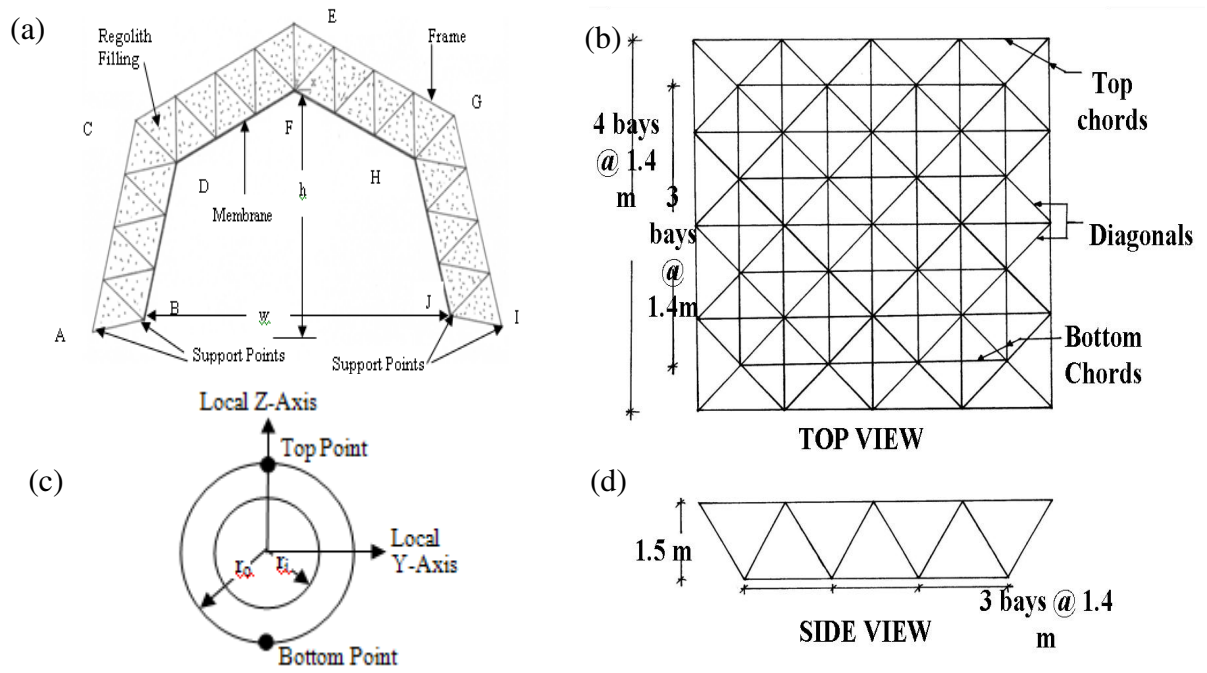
View of proposed structure: (a) Front view; (b) Top view; (c) Frame member cross-section with top and bottom of cross section marked; and (d) Side view.
